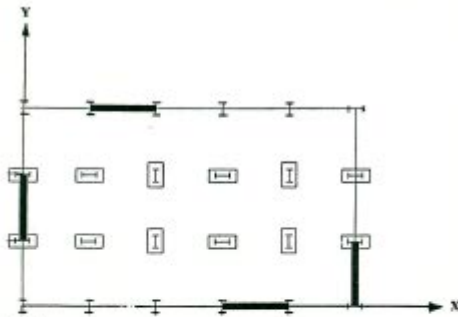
Columns Layout Plan of 16-Story Building (All Internal Columns Are 14W311, All External Columns Are 14W159)
